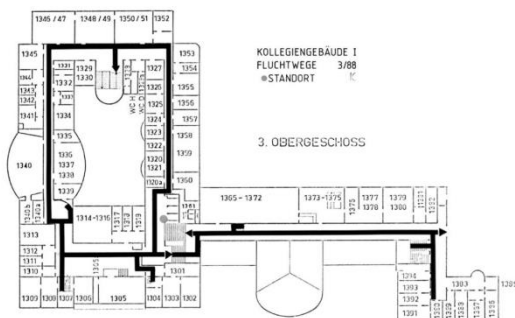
An example fire plan, located in the KG I main section, 3rd floor.
